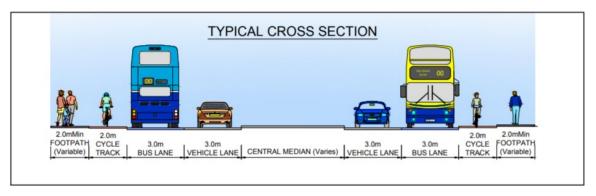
Proposed Road Cross-Section in Section 1 in the Emerging Preferred Route Option
